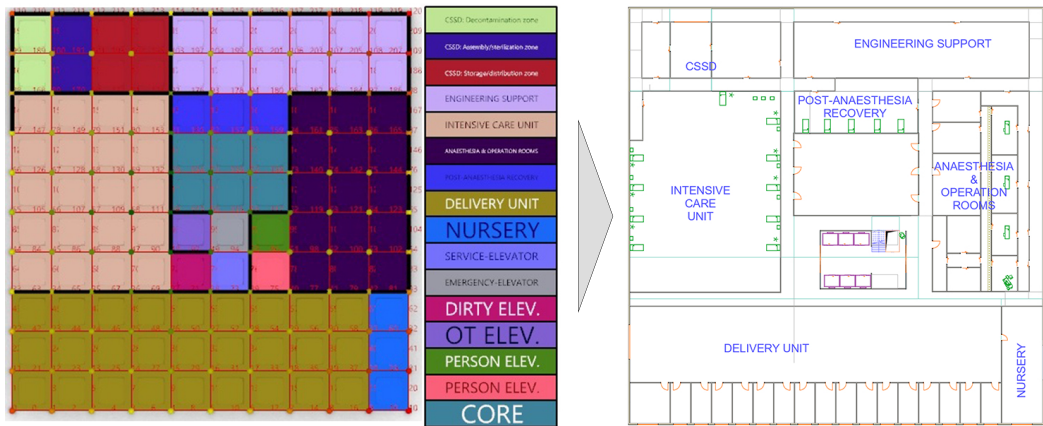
First-floor plans (left: output of the tool, right: technical plans)
